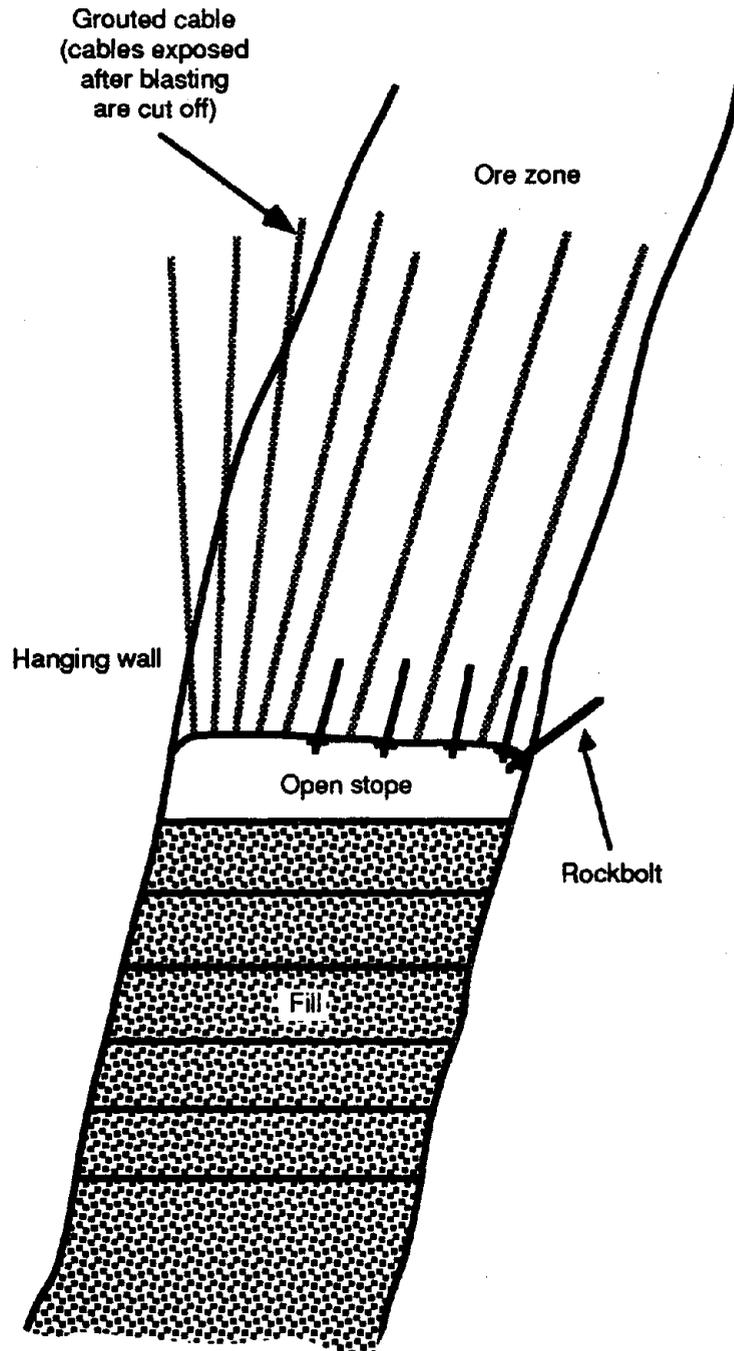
Typical profile of stope after installation of cable bolt supports.
